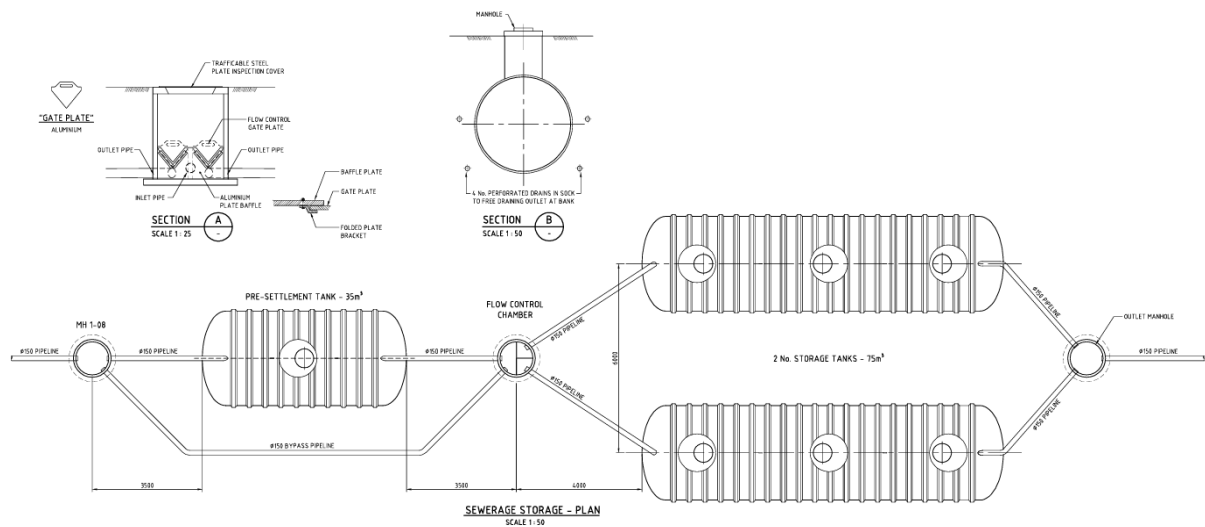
Plan view of existing sewerage storage general arrangement at Carpark 1 (MWH New Zealand Limited, 2014).
